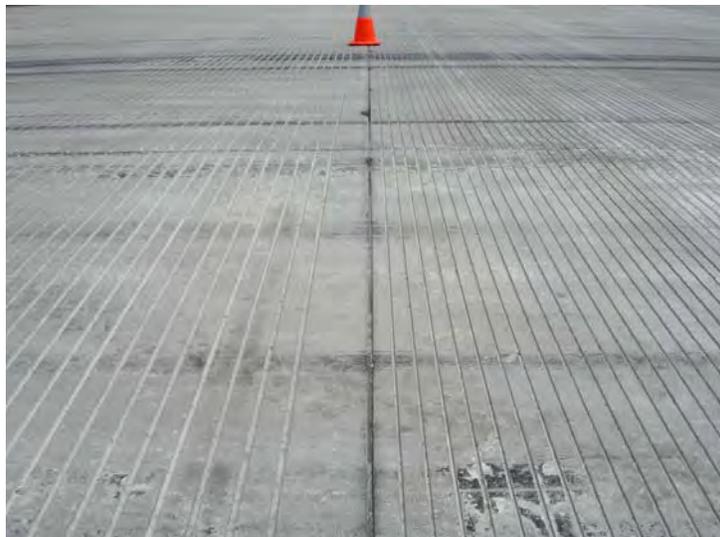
Trapezoidal-Shaped (Left) and Standard (Right) Grooves Installed on Runway 02-20 at MCAF Quantico
